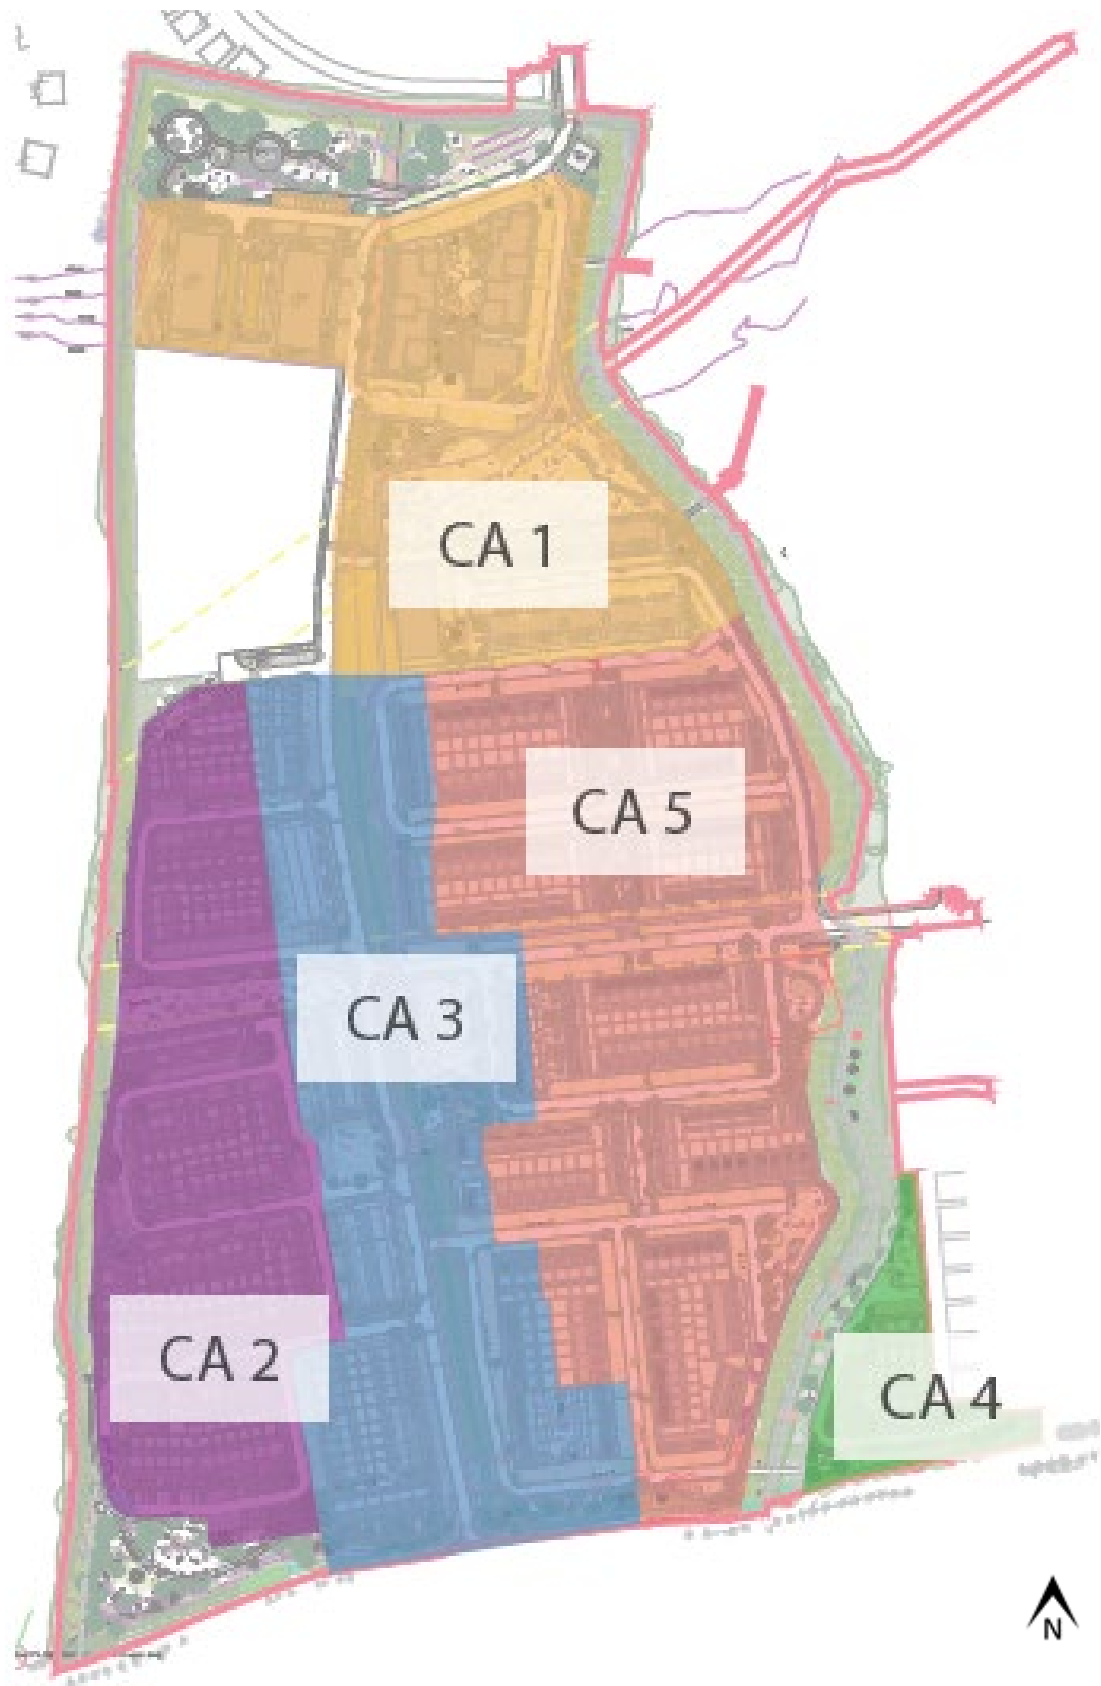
Site layout of proposed development indicating the location and extent of the proposed 5 no. character areas
